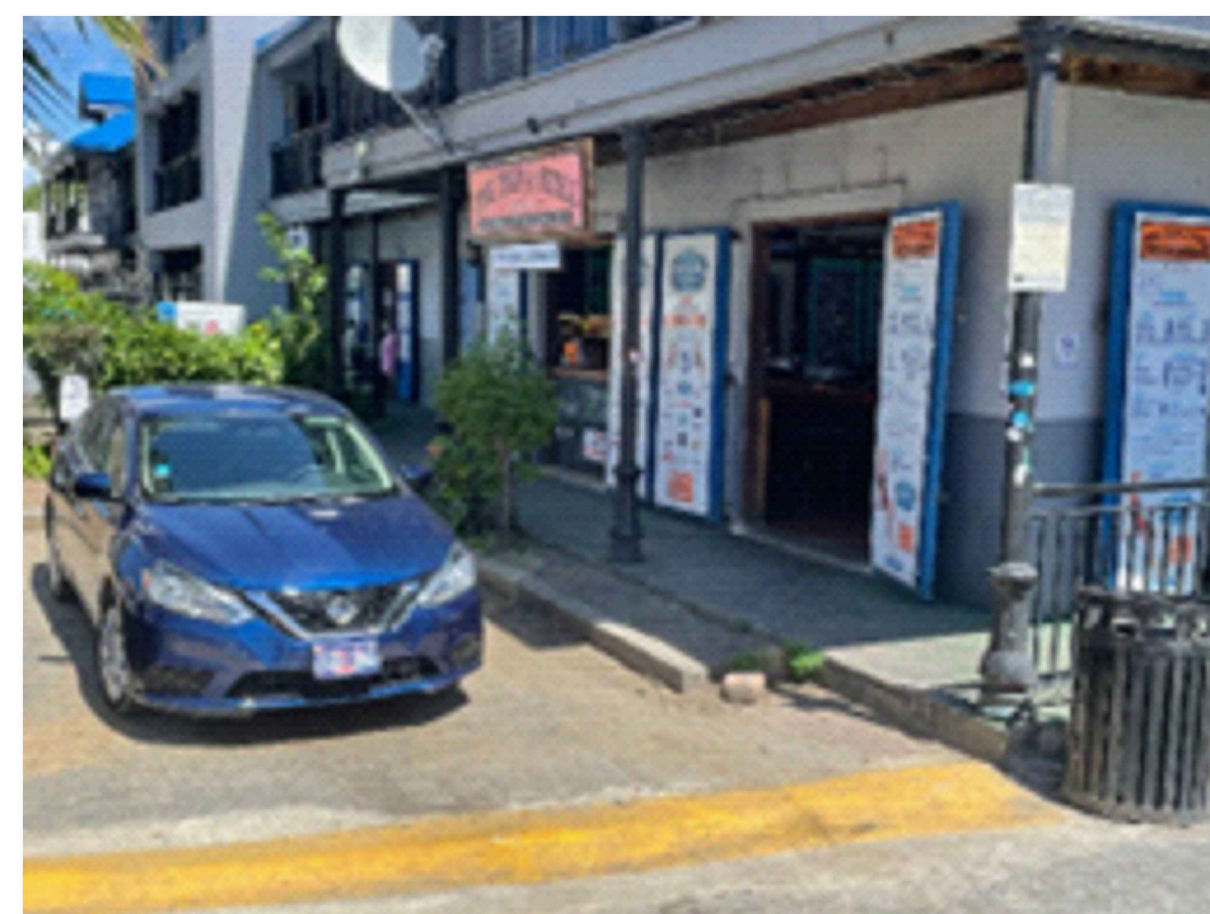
VIEW OF NORTH WEST CORNER OF BUUILDING A FOR LOCATION OF PROPOSED HC PARKING SPACE AND HC RAMP UP TO 1ST FLOOR FRONTING TAP & STILL RESTRAUNT
